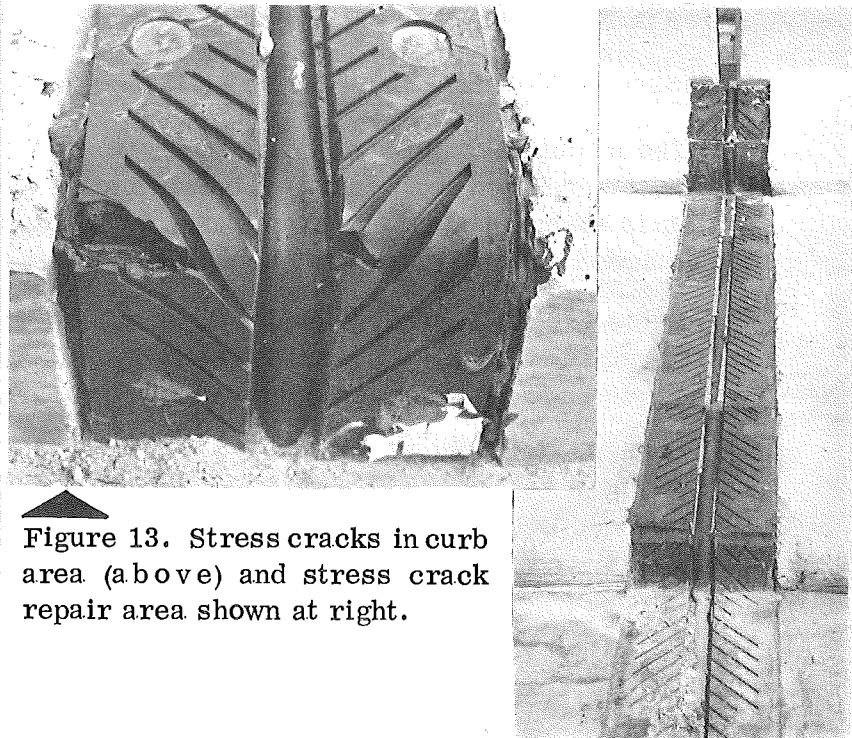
Stress cracks in curb area (above) and stress crack repair area shown at right.
